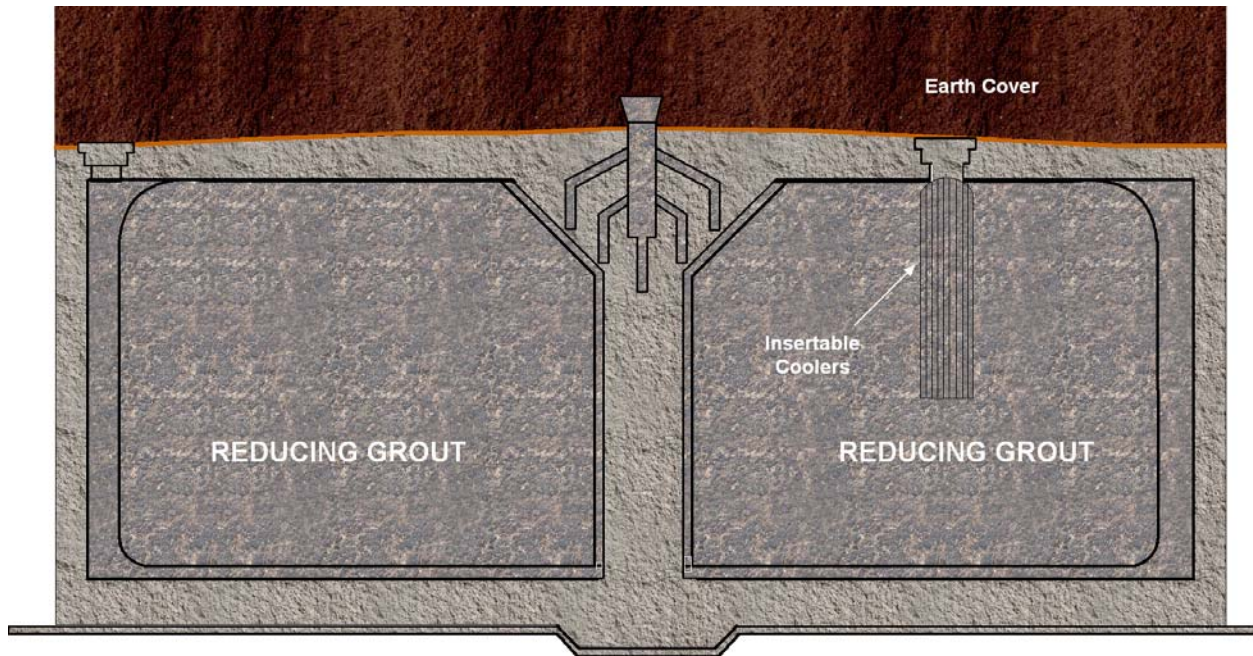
Typical Type IIIA Tank Grout Configuration
